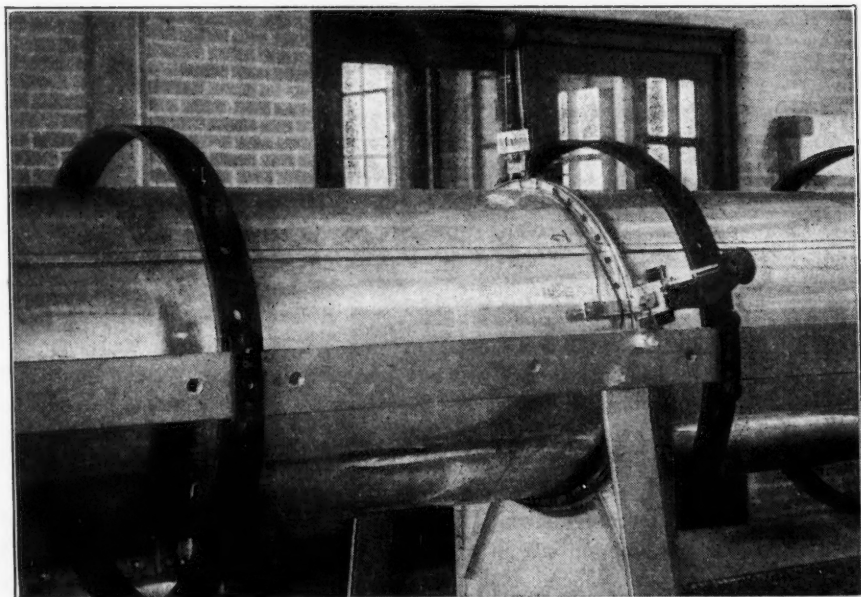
ARRANGEMENT OF TENSOMETERS FOR MEASURING STRESSES IN THE STIFFENING RINGS ON A MODEL PIPE LINE.
